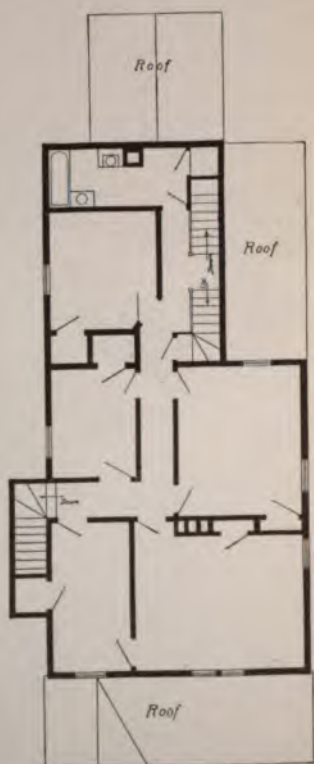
HOUSE FOR EMPLOYEES, PLAN K
